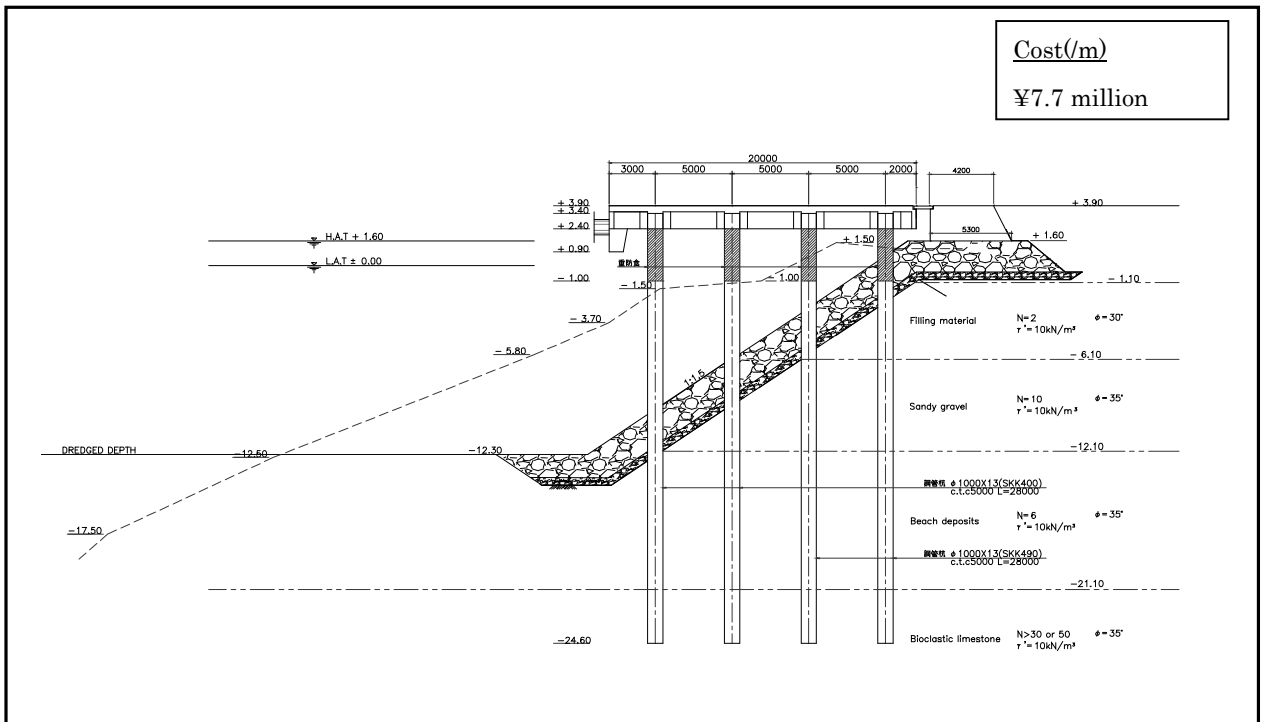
Open Type of wharf on Steel Pipe Piles (Option 2)
